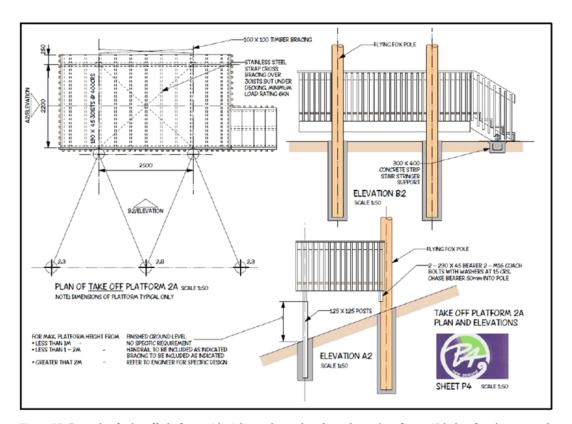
Example of take-off platform with zipline poles and anchors shown (see figure 13 below for alternate pole footing design).
